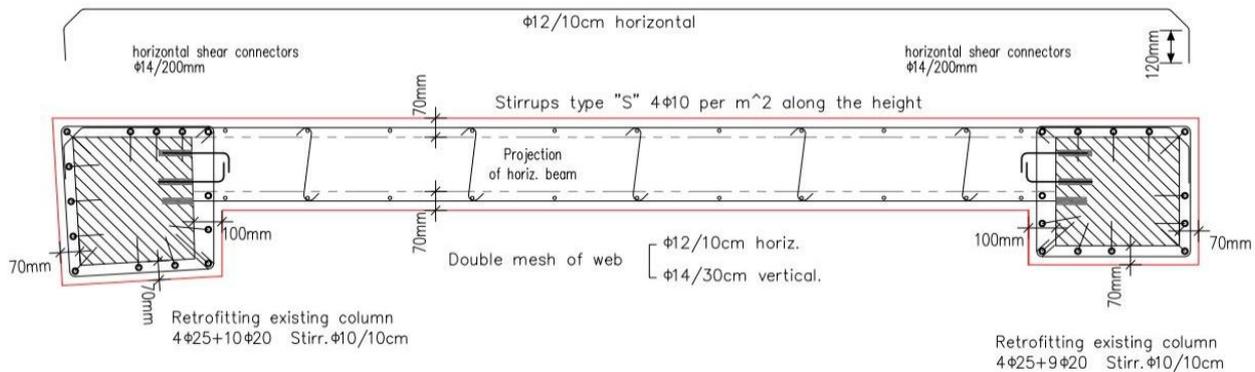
Sectional detailing example of new shear wall between existing column frame.
